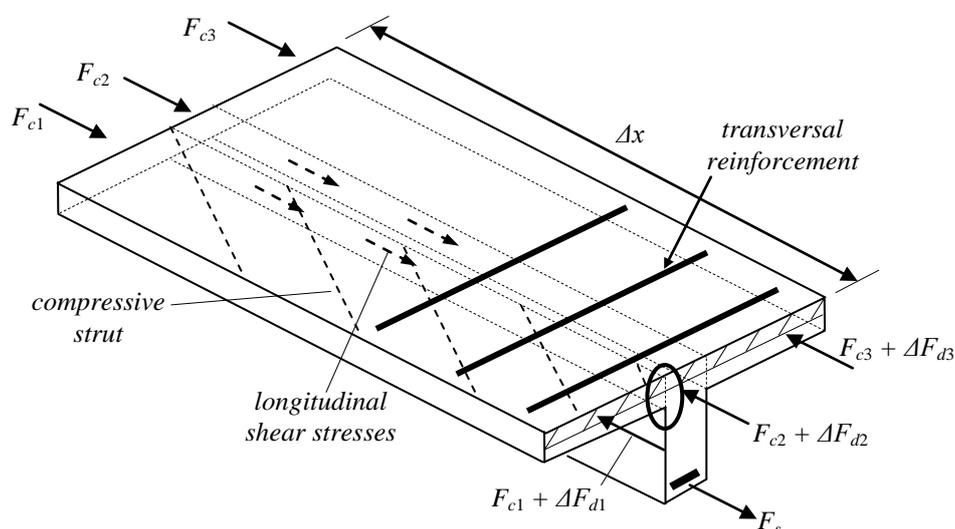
Forces acting in a reinforced concrete T-beam subjected to bending moment.
